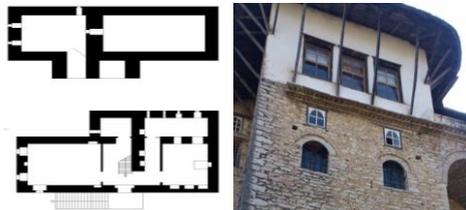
The main façade of a fortified residential building, main floor plans and materials applied in exterior. (Source: Historia e Arkitektures Shqiptare, UNESCO, Denisa Hajnaj)
